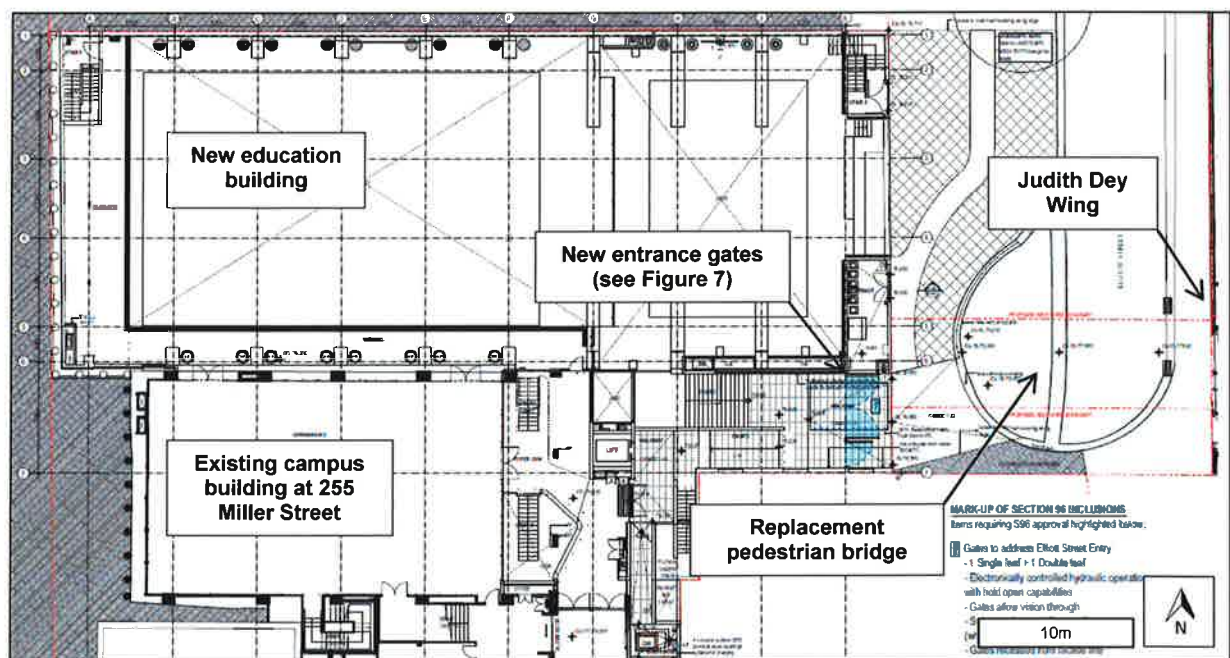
Extract from proposed level 2 plan (source: Application documents, 2018)
